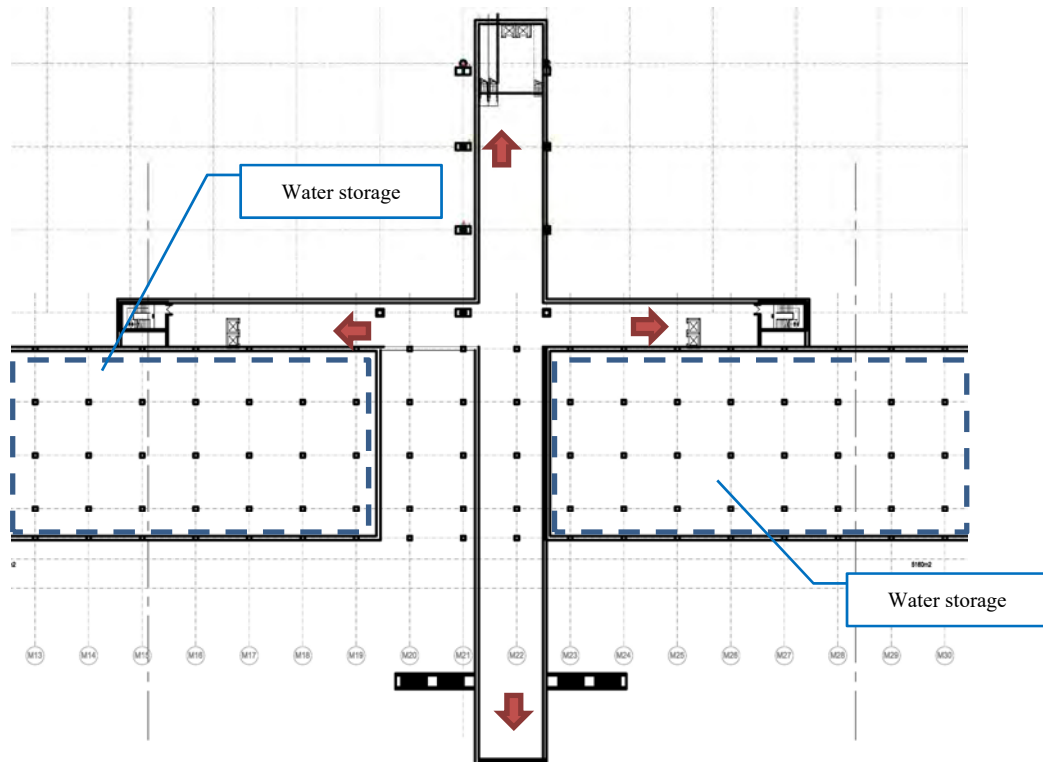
Cross Section of Underground Pedestrian Corridor
